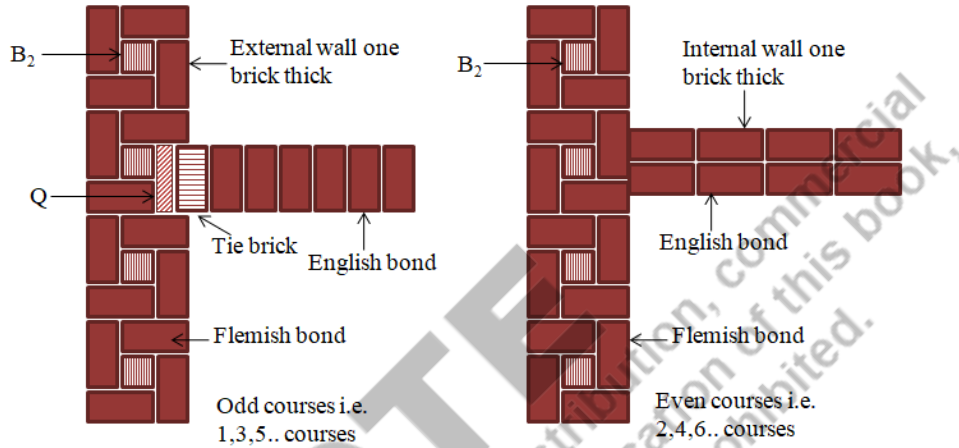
(a) Tee-junction between the one brick thick internal wall in English bond and one brick thick external wall in Double Flemish bond
